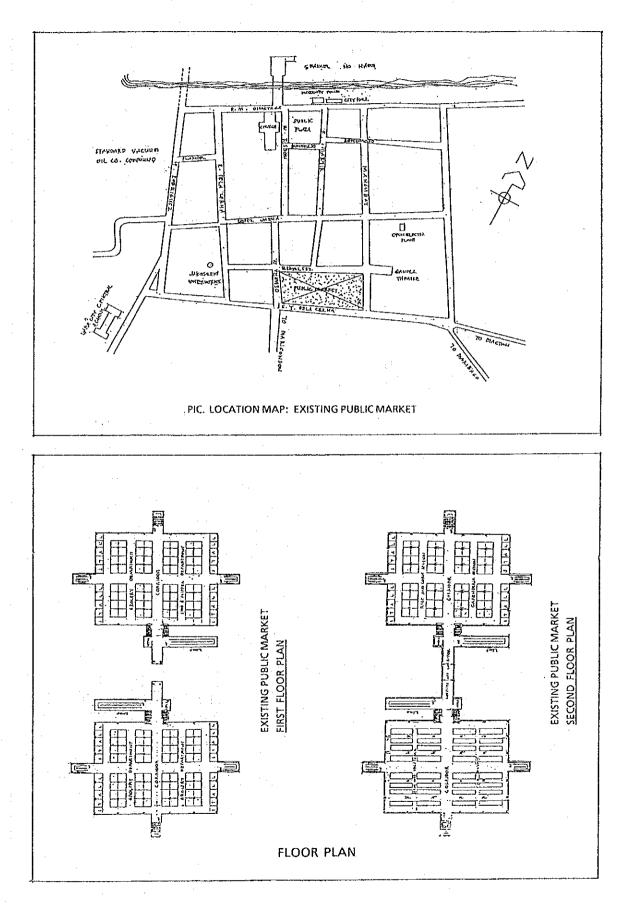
1 - 1: Lapu-Lapu City, location map and floor plan of the existing market.
